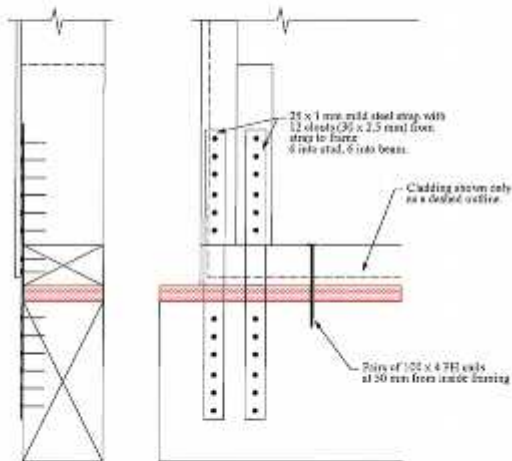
Connection of 0.6 m Long Wall to Timber Foundation
